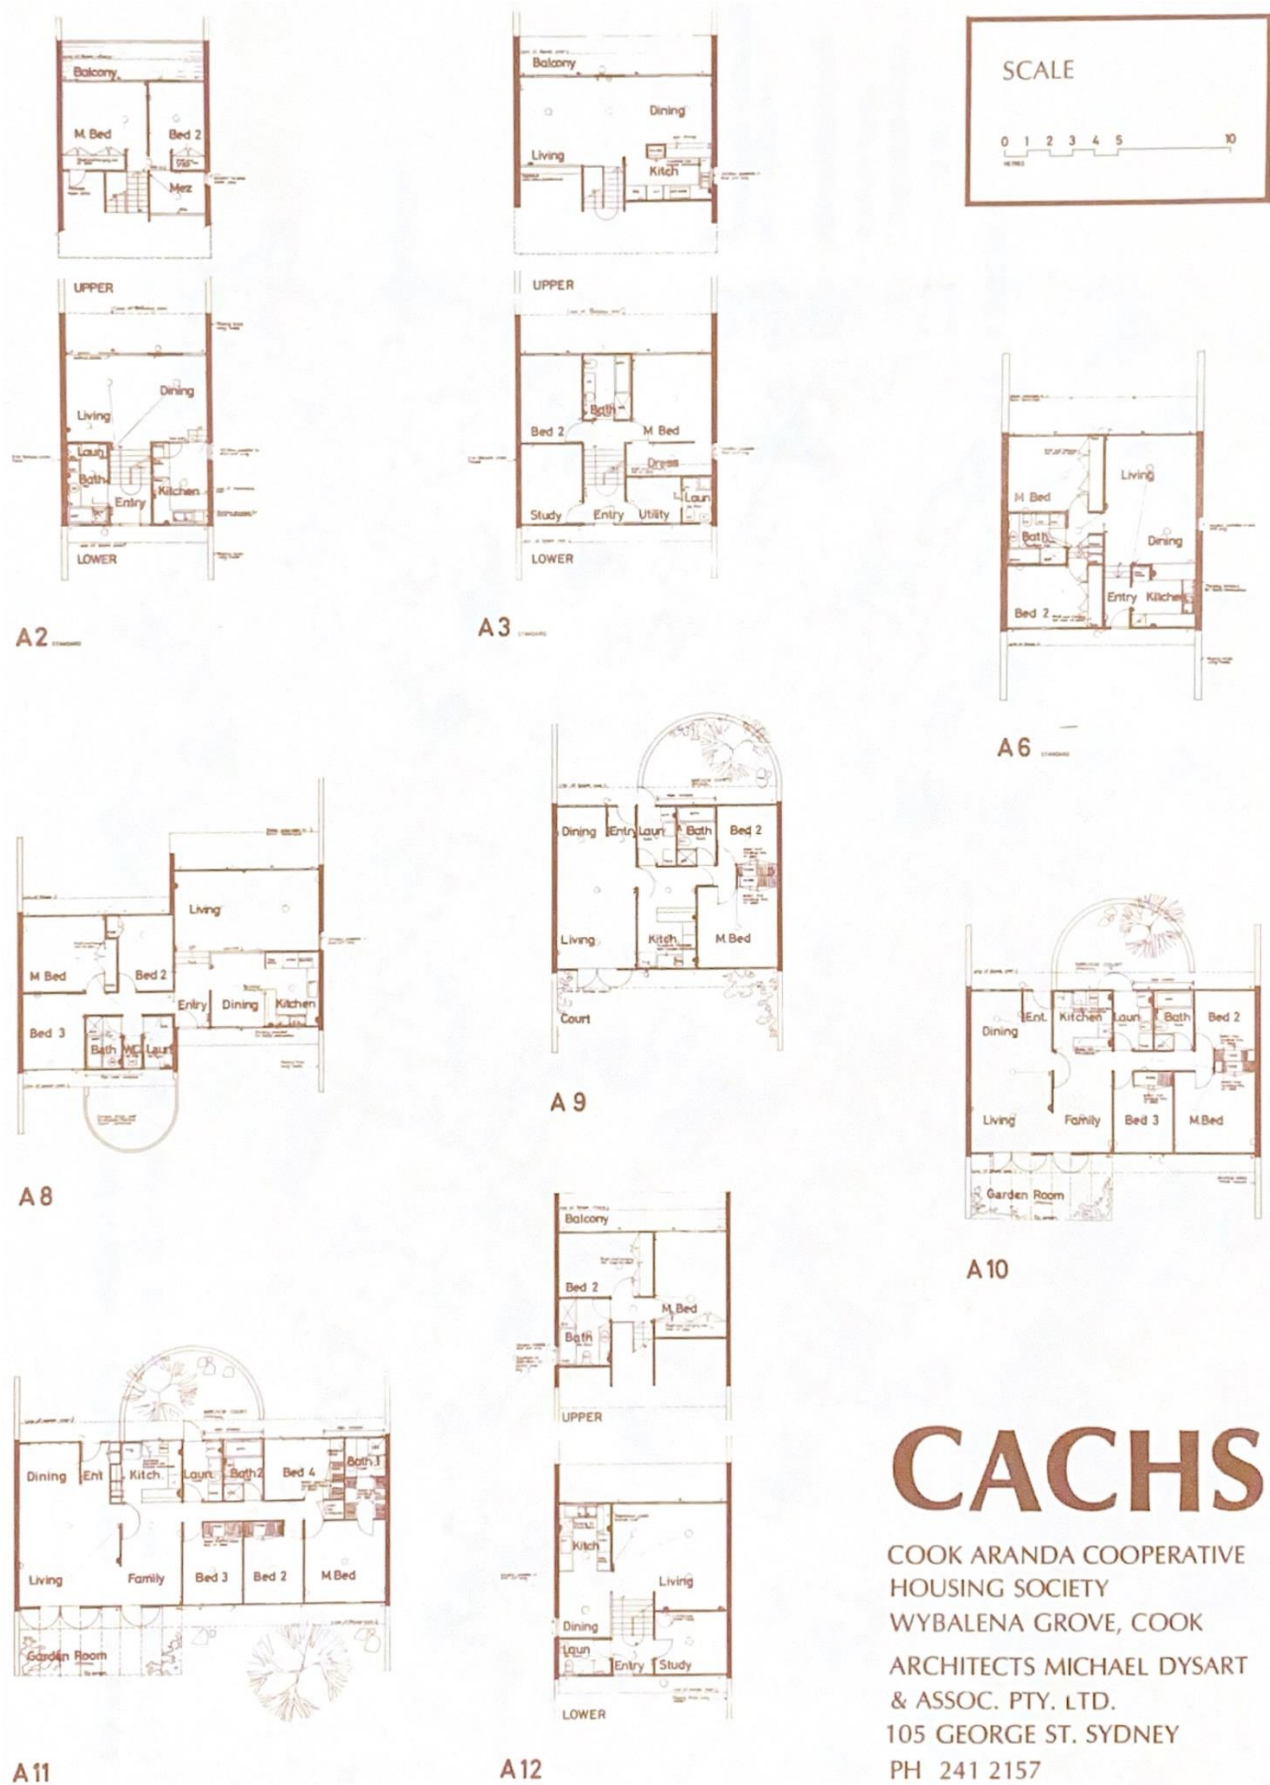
Floor plans for 2, 3, and 4 bedroom houses available for purchase in Stage 2 (CACHS c. 1979)
